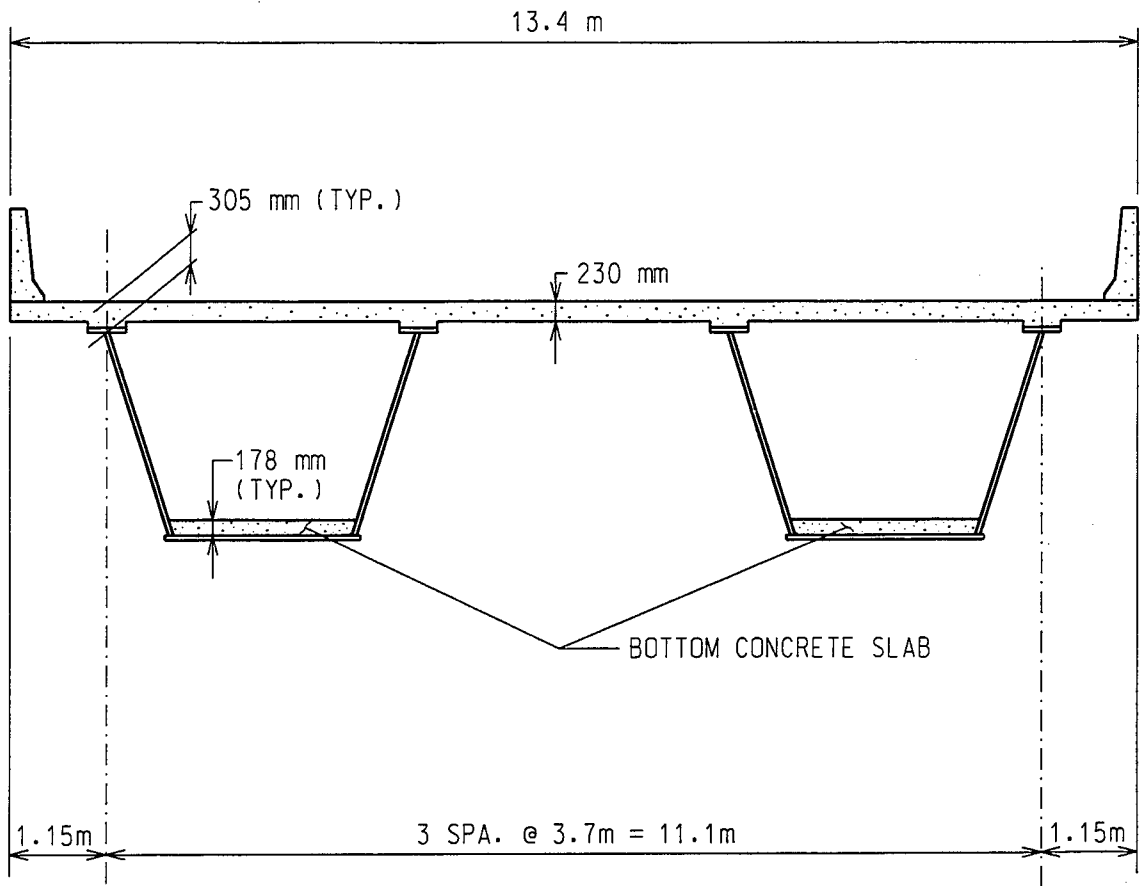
Typical Section – Double Composite Box Girder Design.
